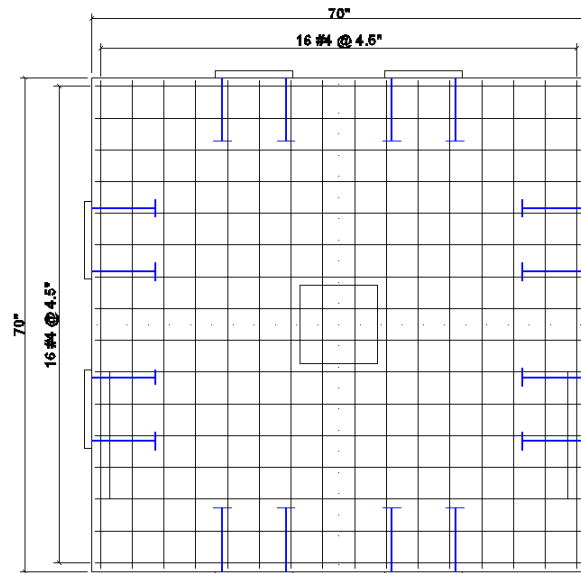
Tension reinforcement for 1.0% reinforcement ratio
